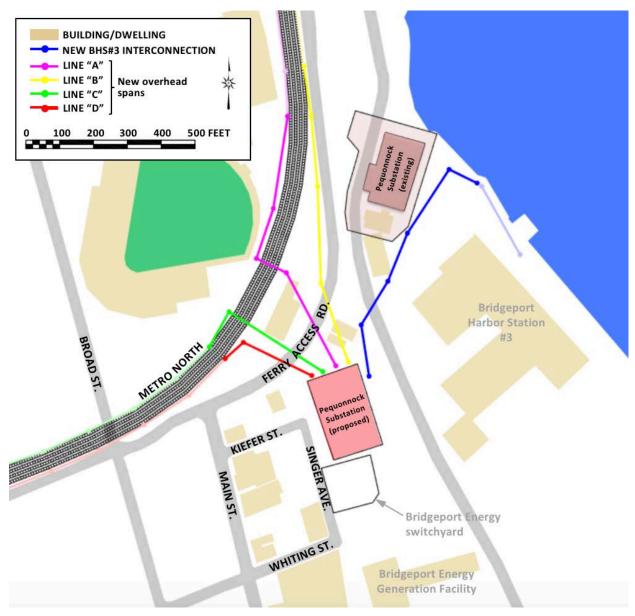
Plan view of the proposed Pequonnock Substation and surrounding area, showing the repositioned spans of the overhead 115-kV circuits on the adjacent ROW.
